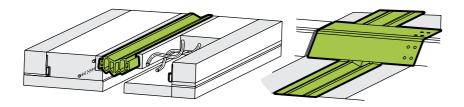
Detail of the footpath joint. Right: kerb cover plate.
